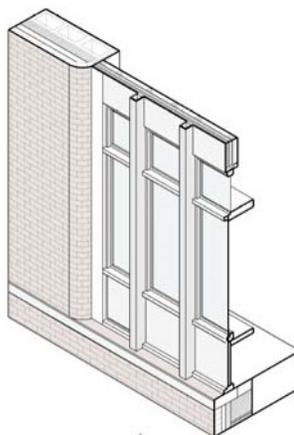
Cumberland, MD – Wall Detail, Source- Author, 2014
